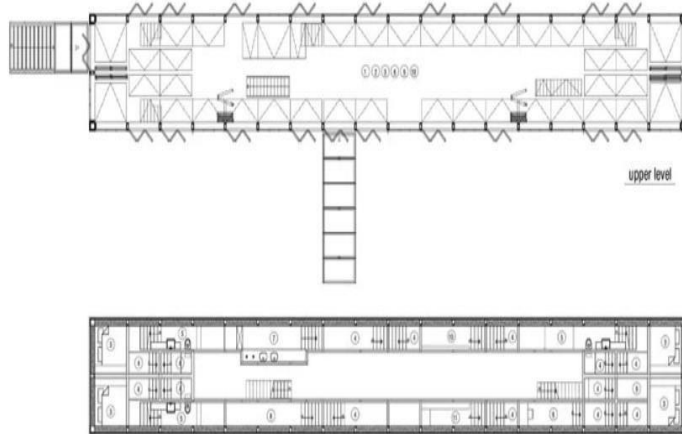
Floor plans showing the opening of floor surfaces, and division and joining of exterior vertical screens.
